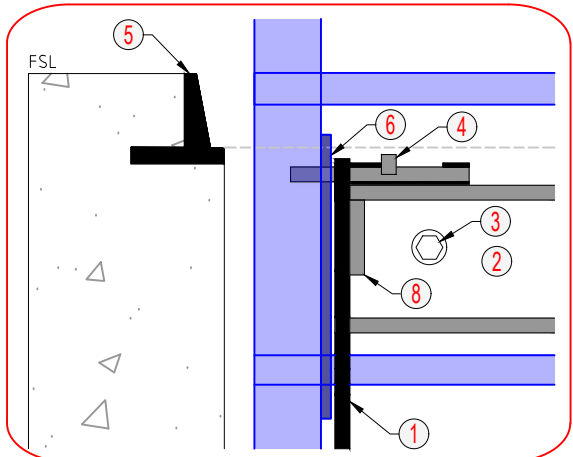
ROTATING STANCHION ARRANGEMENT
